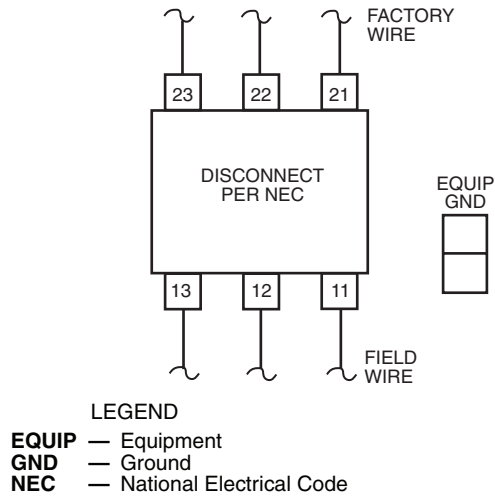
Field Power Wiring Connections for Factory-Installed Disconnect
